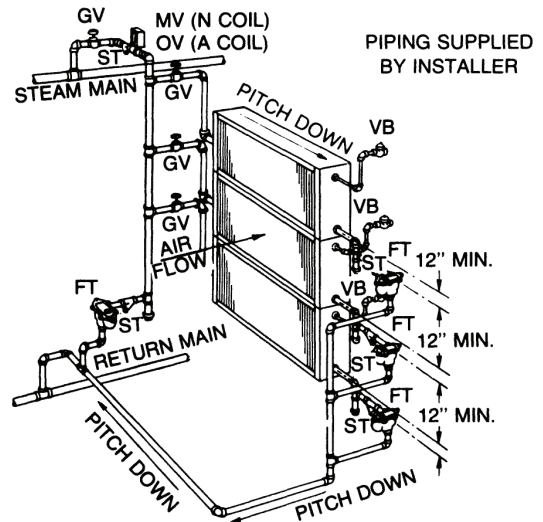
Typical piping for type A or N steam coils, vertical tubes for horizontal airflow
